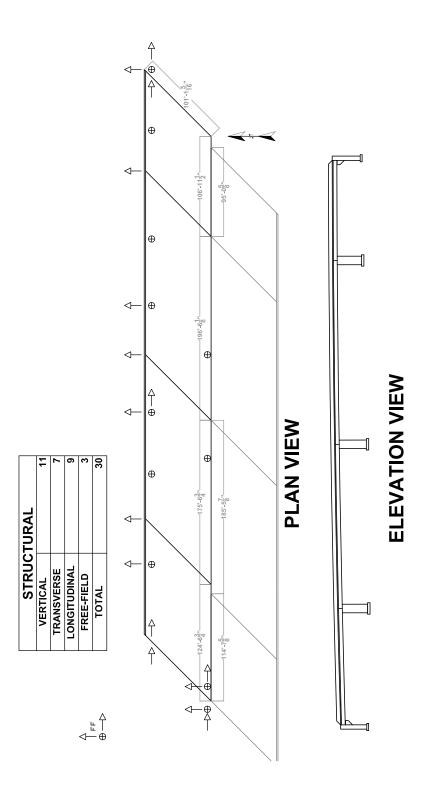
Proposed Instrumentation plan of Bridge F-774; Plan and Elevation Views
